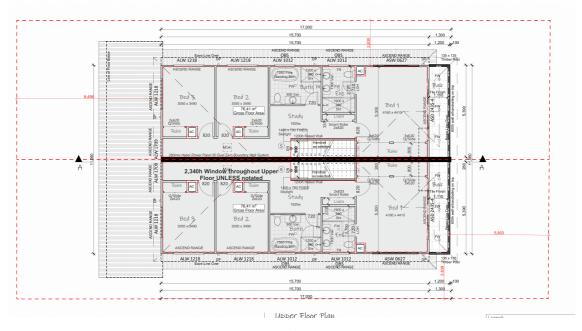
− 7 show the layout of the proposed dwellings at each level.
